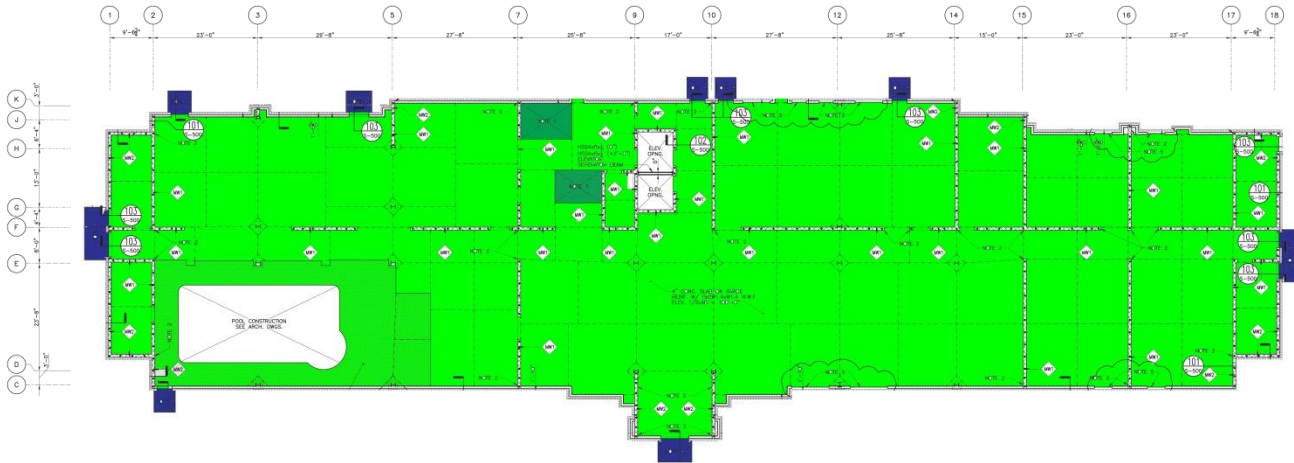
Slab on grade. Light green- 4" Conc. Slab on grade w/ 6x6W1.4xW1.4 W.W.F.
